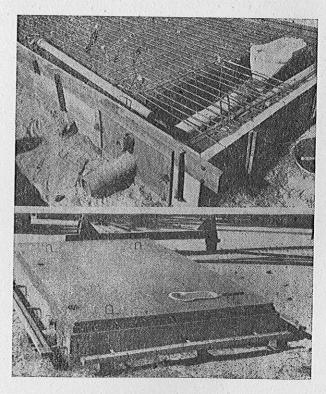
(a) TOP, REINFORCEMENT CAGE AND PLUMBING FIXTURES IN POSITION, 5(b) Bottom CASTING DONE, SIDES OPENED
